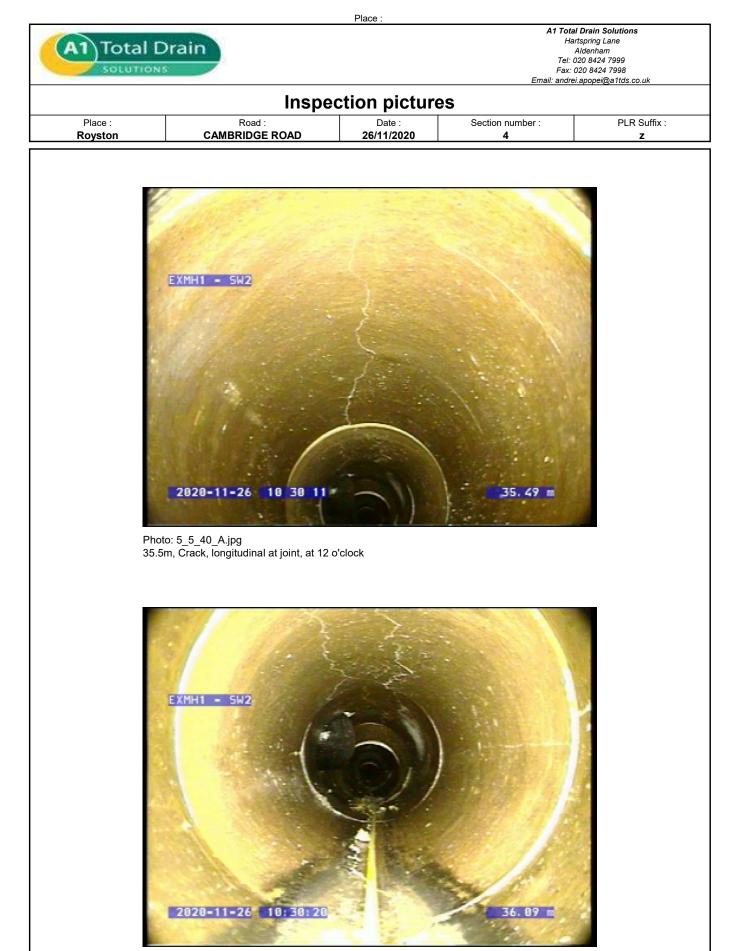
5_41_A.jpg 36.2m, Crack, longitudinal at joint, at 11 o'clock
